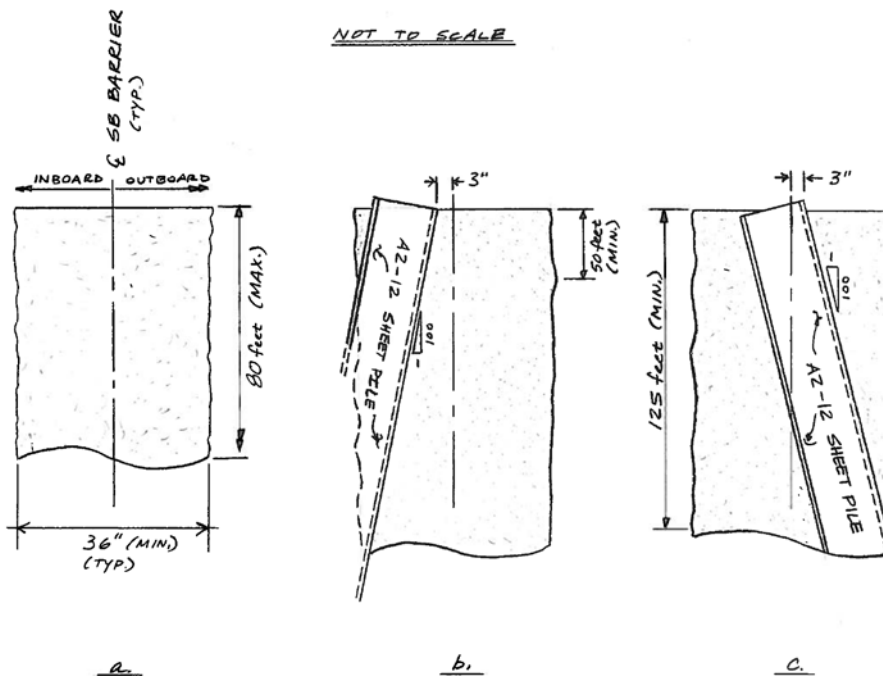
Assessment of Verticality of Sheet Pile Wall: (a) Existing SB Barrier; (b) Sheet Pile Installed at Inboard Limits; (c) Sheet Pile Installed at Outboard Limits
